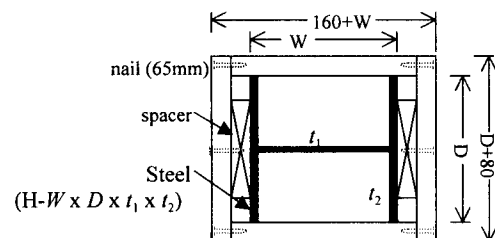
Cross Sectional Shape of Tested Steel Columns (Unit in mm)
